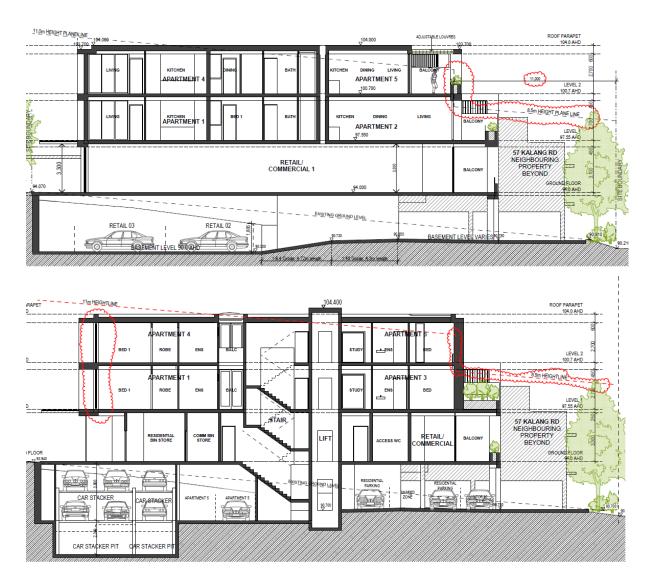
Cross section extracts from Plan DA06(A) showing extent of building height breaches
